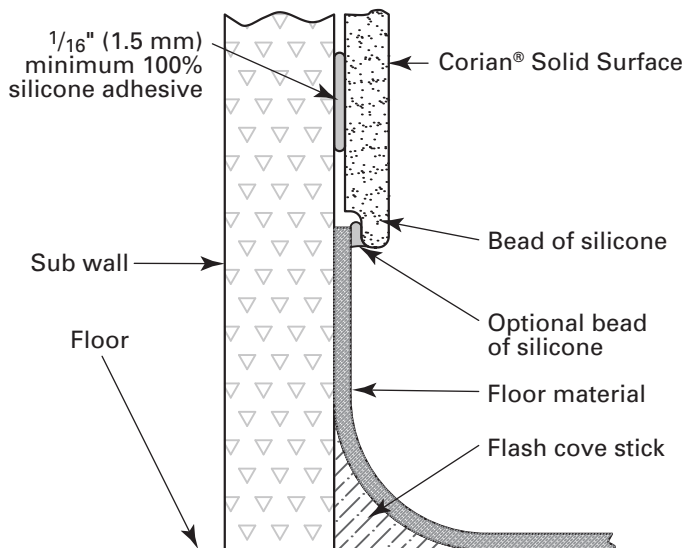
WALL BASE DETAIL WITH DADO AND FLASH COVE
